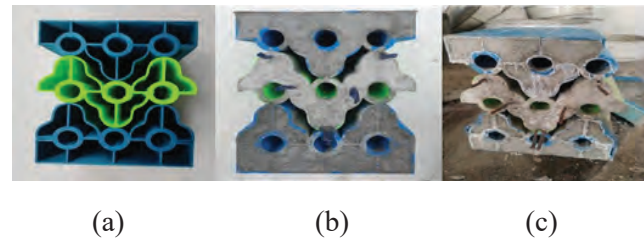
(a) 3D printed prototype of 3x3 block (b) Composite filled with concrete (c) Damaged TPU- PLA model
